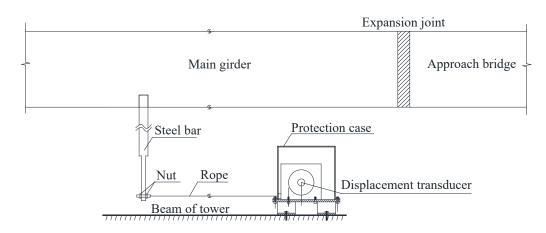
Sensor layout of the Jiangyin Suspension Bridge.
